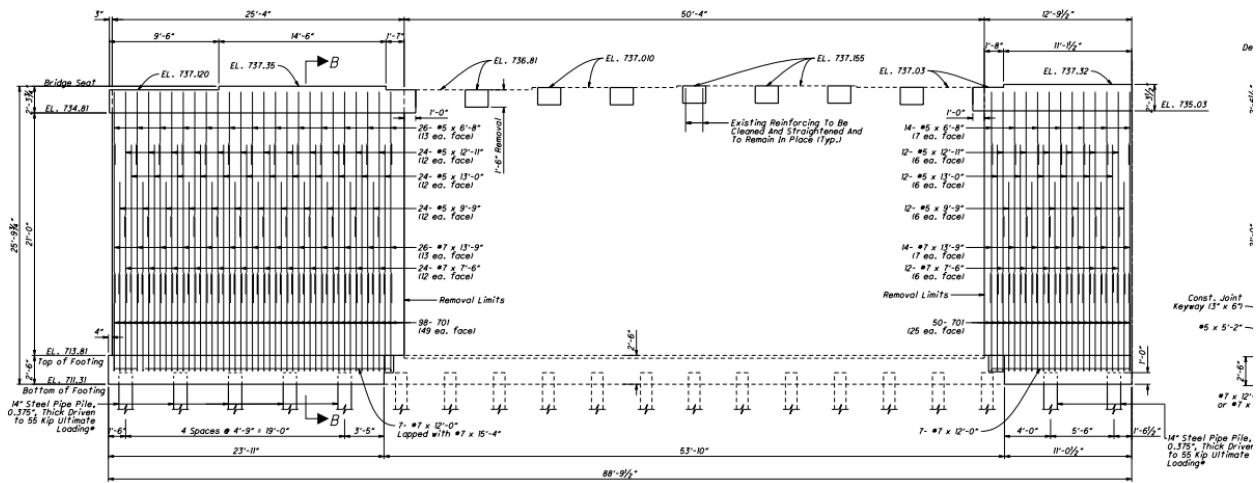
Transverse Elevation of Interior Pier (NBI 50340) (2009)
